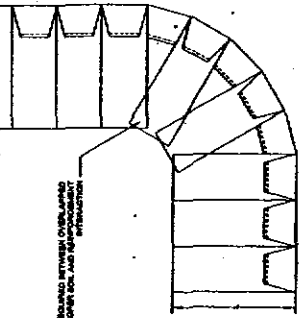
PLAN FOR CURVED WALL WITH REINFORCEMENT
